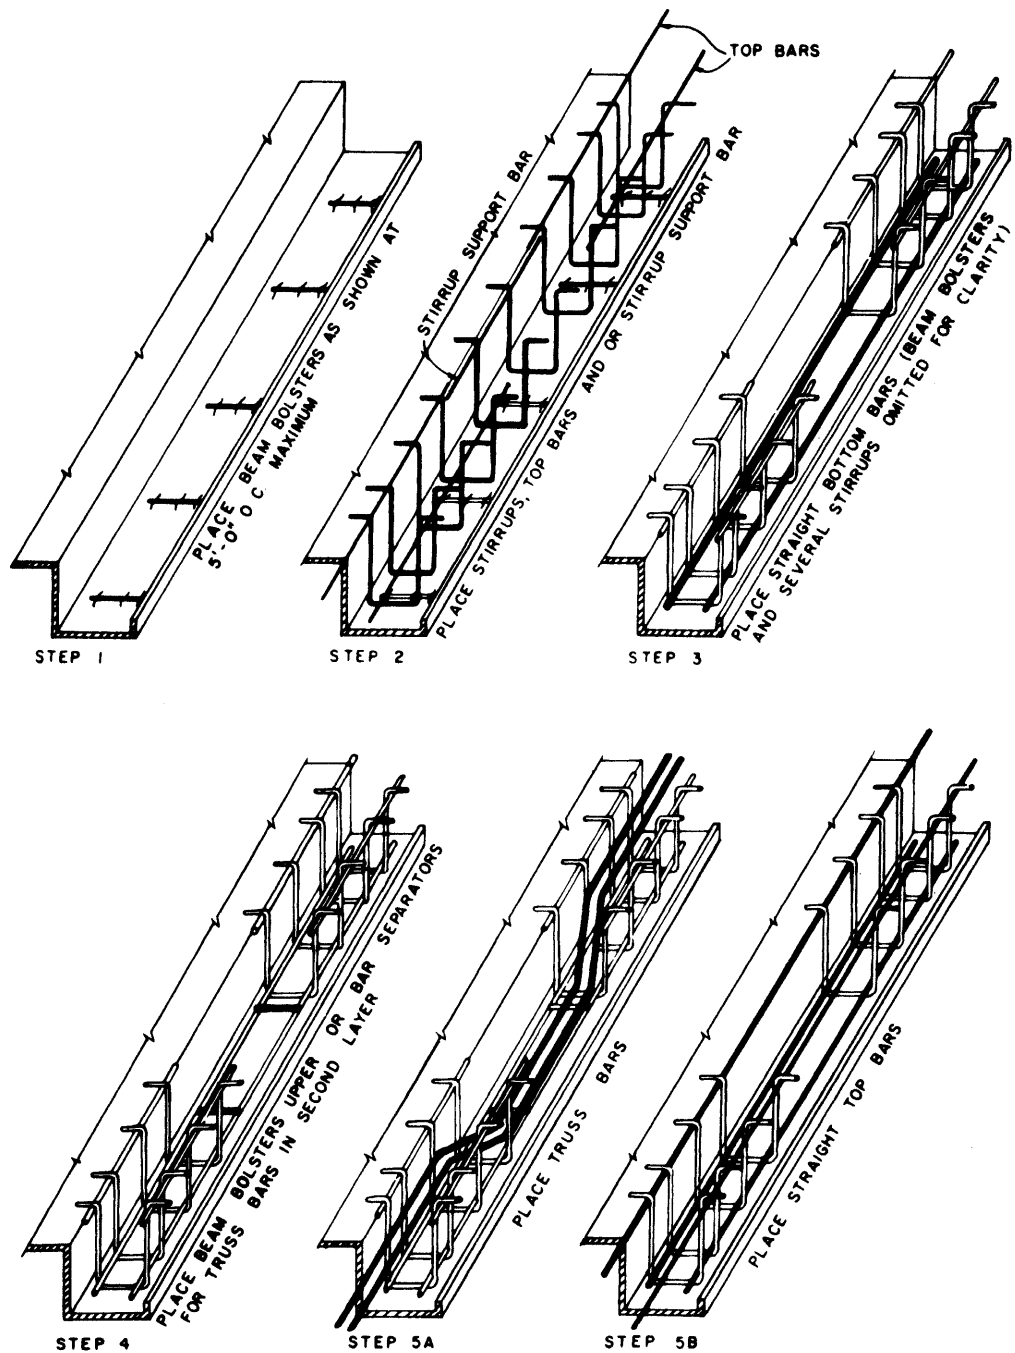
Placing reinforcing steel in a beam. (Courtesy of Concrete Reinforcing Steel Institute)
